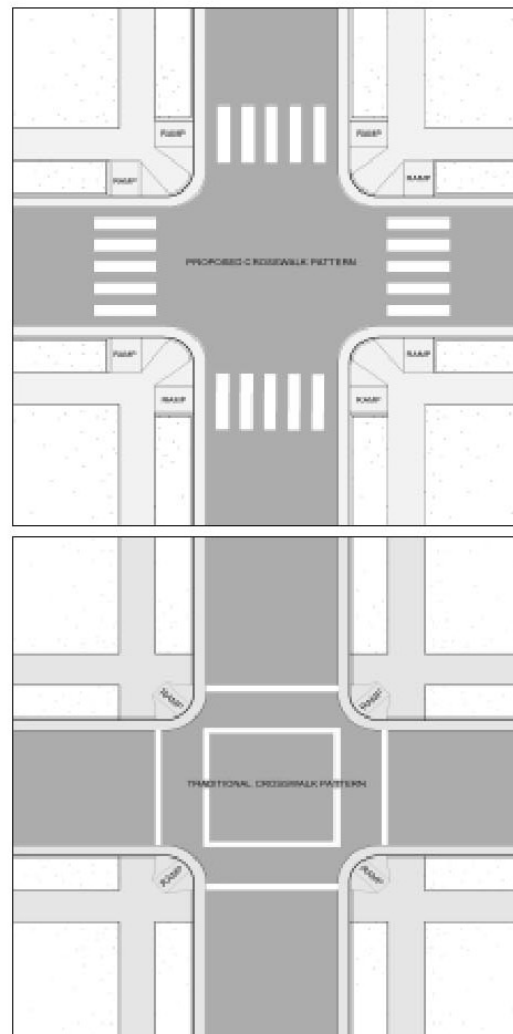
To ensure that crossing distances are minimized and that ramps are on the same alignment as crosswalks, corners should include curb ramps for both crosswalks, as shown at top. Diagonal curb ramps, as shown at bottom, require wheelchair users to re-align their wheelchair while in the street in order to remain in the crosswalk.
